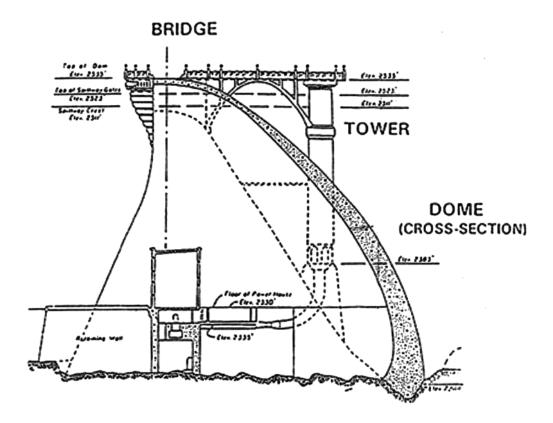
Cross-section through Coolidge Dam (Courtesy of Bureau of Indian Affairs [BIA] archives).
